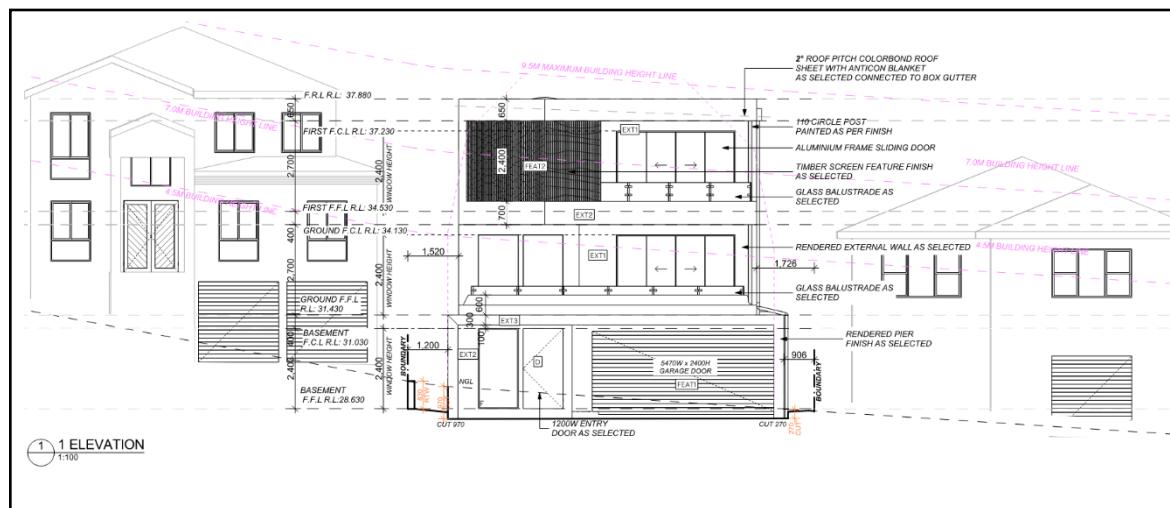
South Elevation (Streetscape) - 54 Daunt Avenue (Source: Prime Design Studios)
